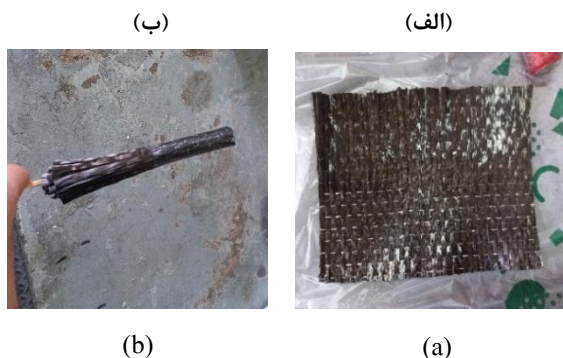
Steps of anchor construction: (a) cutting CFRP to required lengths; (b) rolling the anchor around the dowel
